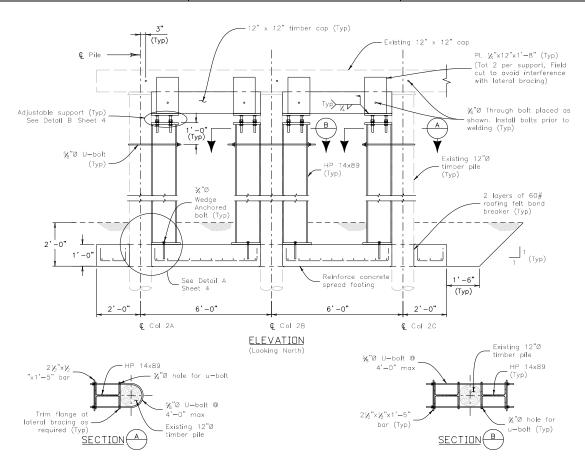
(G)-5 Sample of Adding Columns to a Pile
